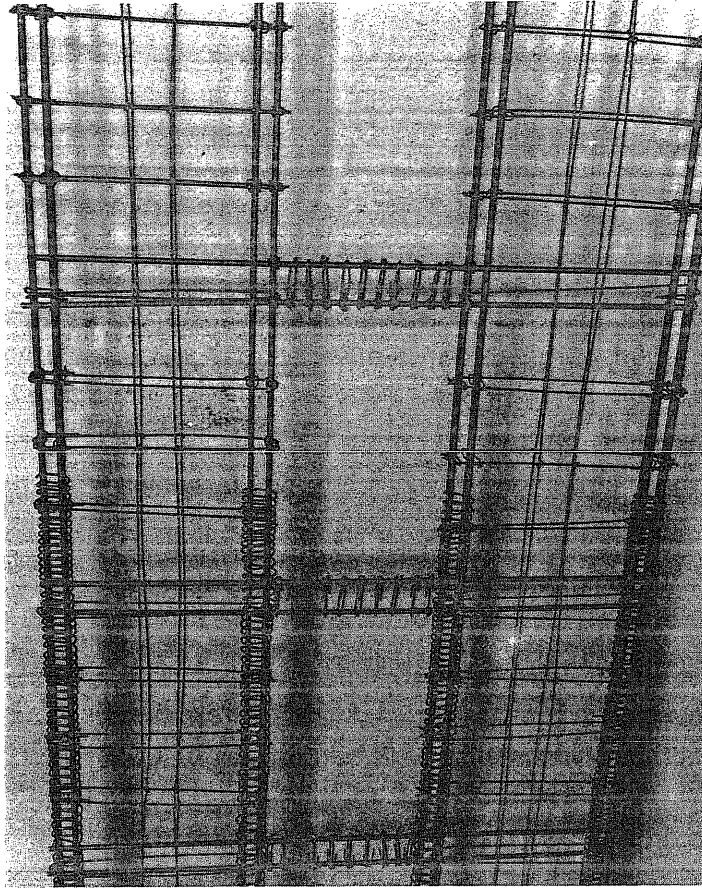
Beam and Wall Reinforcement (Frame D)
